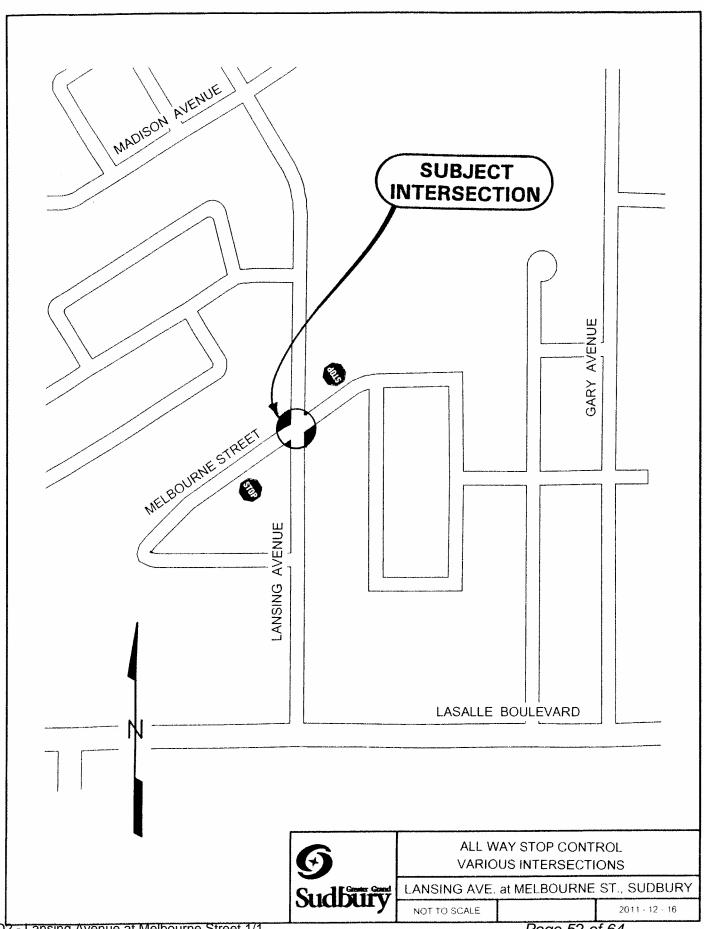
Lansing Avenue at Melbourne Street 1/1
